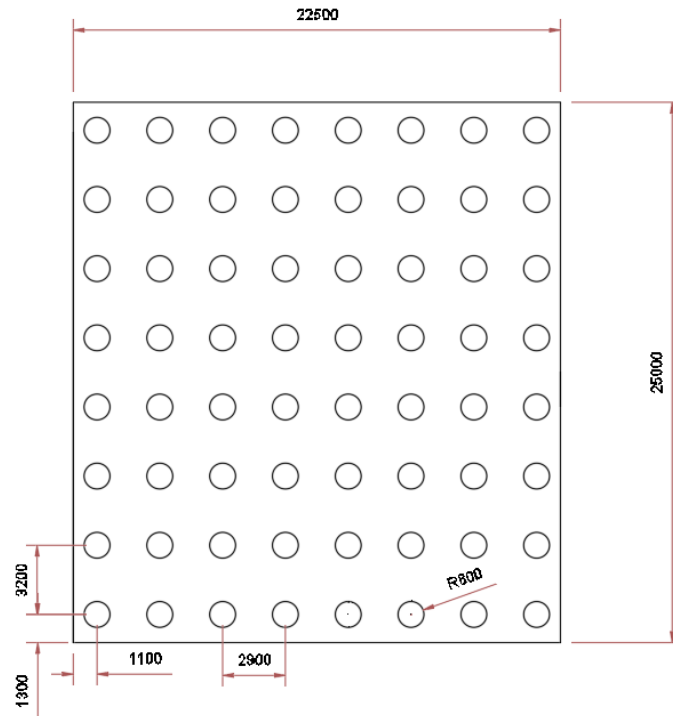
Pile dimensions of the main pier (Mouchel/WSP, 2017)
